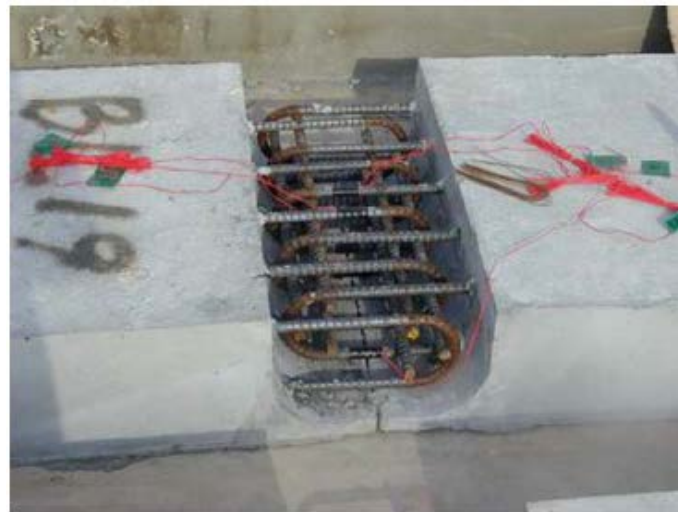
Alternating Looped-Bar Joint (Ryu 2007)
